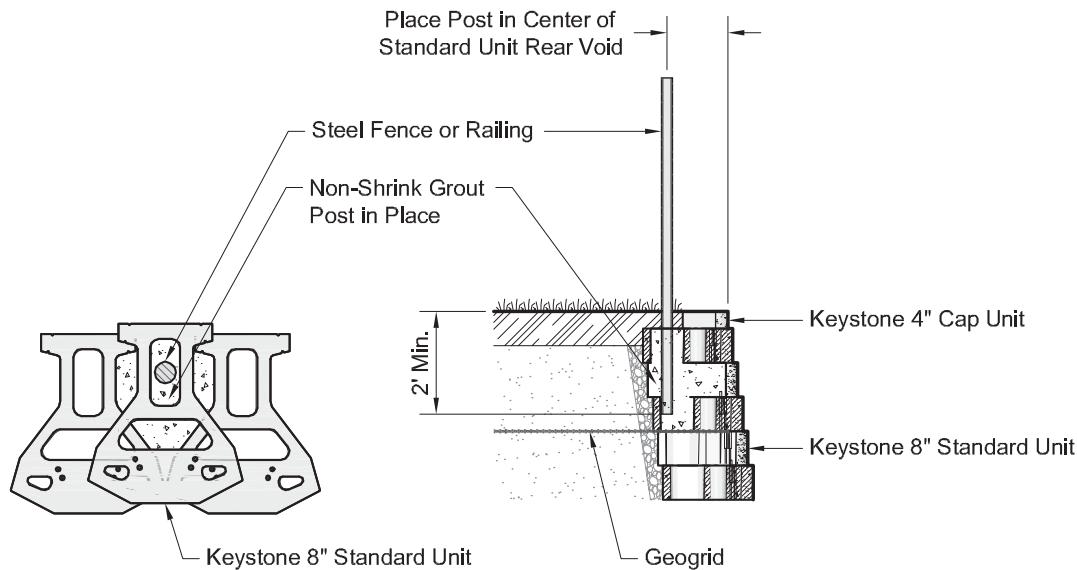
DIRECT MOUNT RAILING IN STANDARD UNIT WALL - 1" SETBACK
